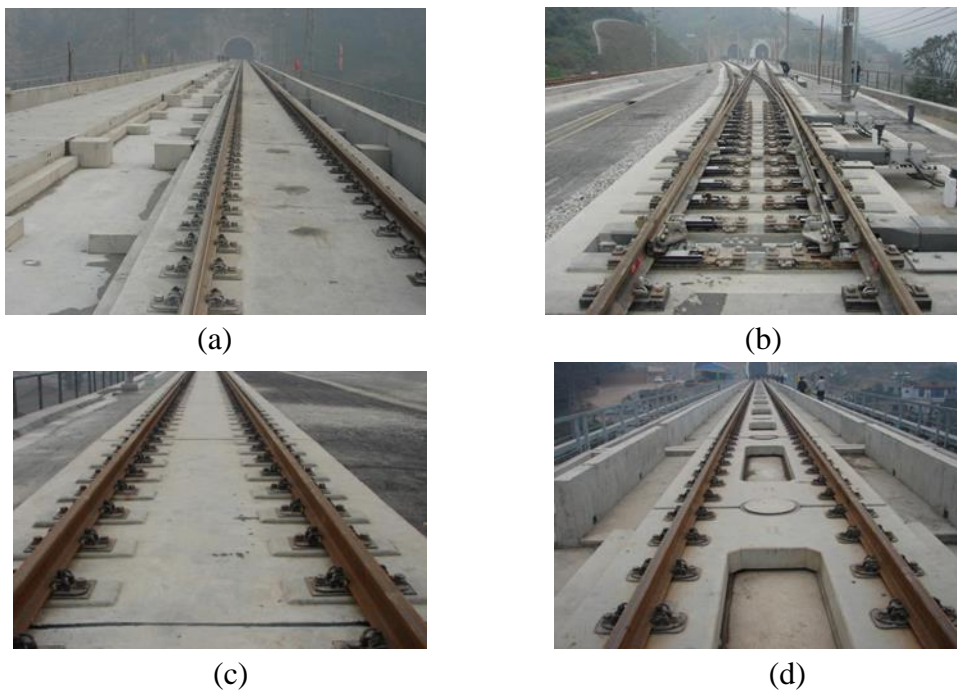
a) Longitudinal connected slab track on bridge; b) Embedded long sleeper ballastless track in turnout; c) Twin-block ballastless track on subgrade; d) Frame-slab track on bridge [8].
